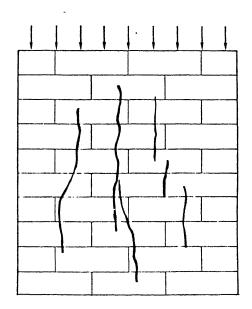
Typical failure pattern in a brickwork wall.
